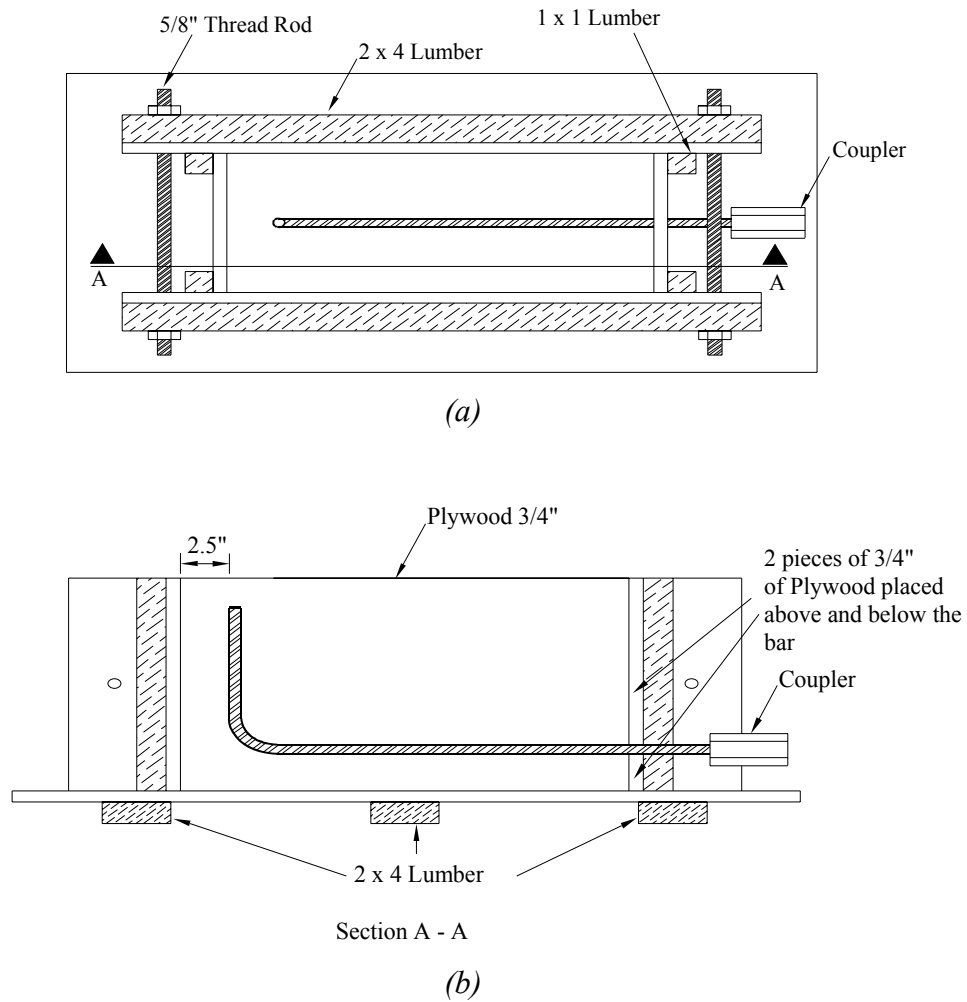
Formwork for casting specimens (a) plan view, and (b) section.
